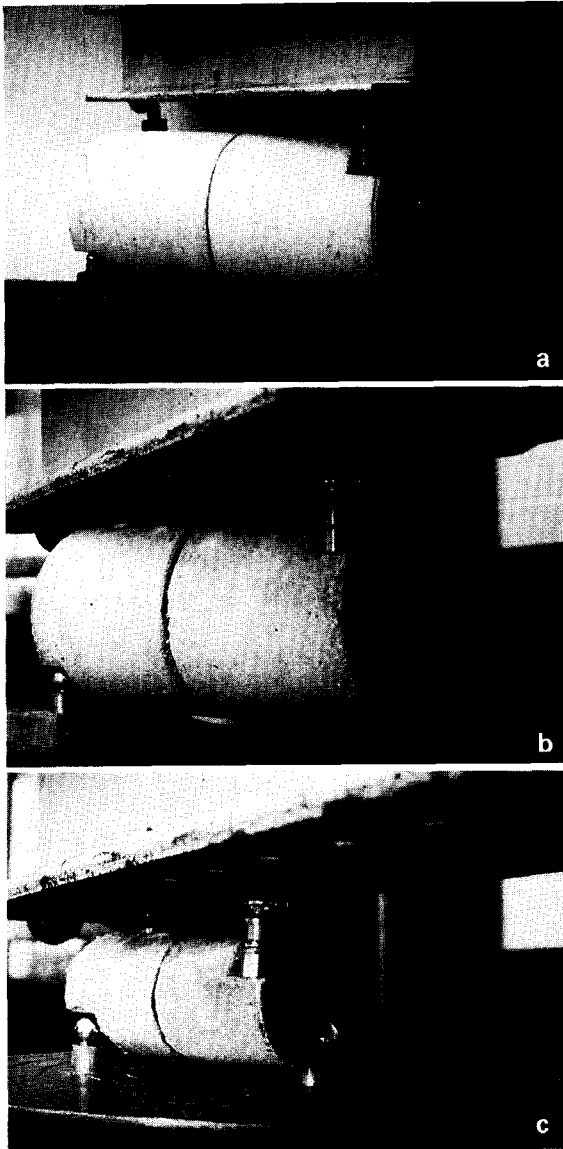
Specimens during test and the loading arrangement: (a) large specimen ( $d = 6$  in.); (b) medium specimen ( $d = 3$  in.); and (c) small specimen ( $d = 1.5$  in.).
